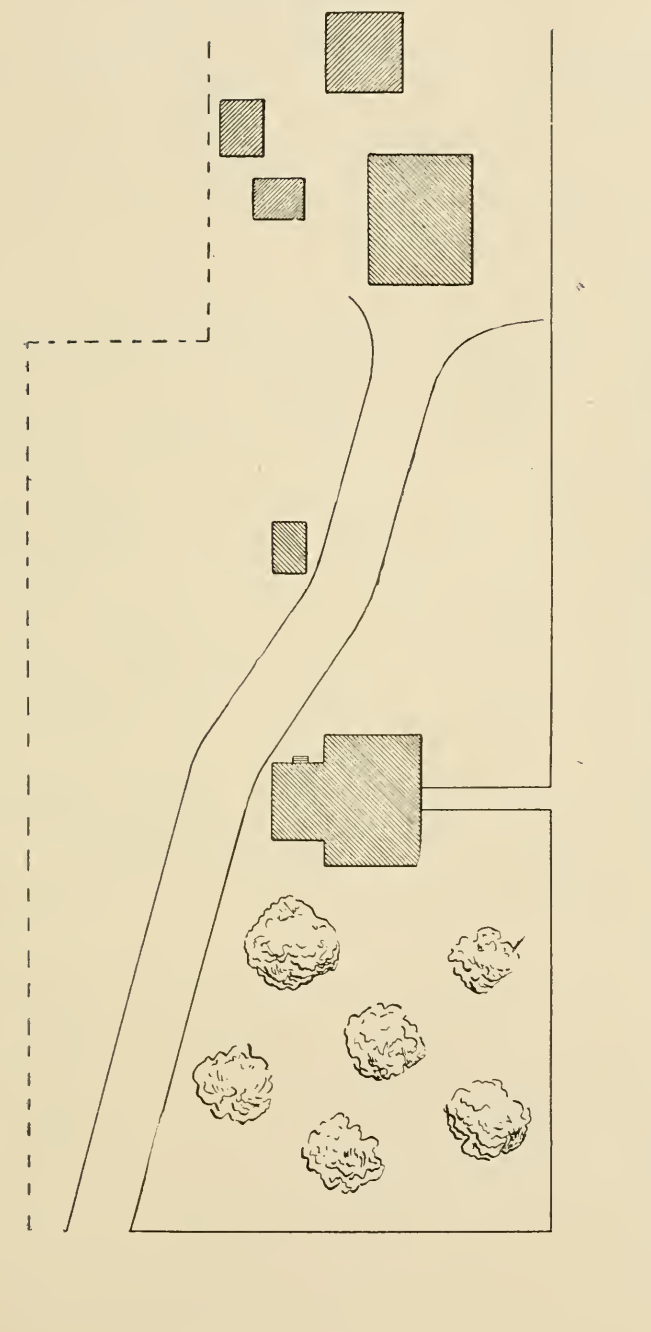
ORIGINAL PLAN OF GROUNDS.
